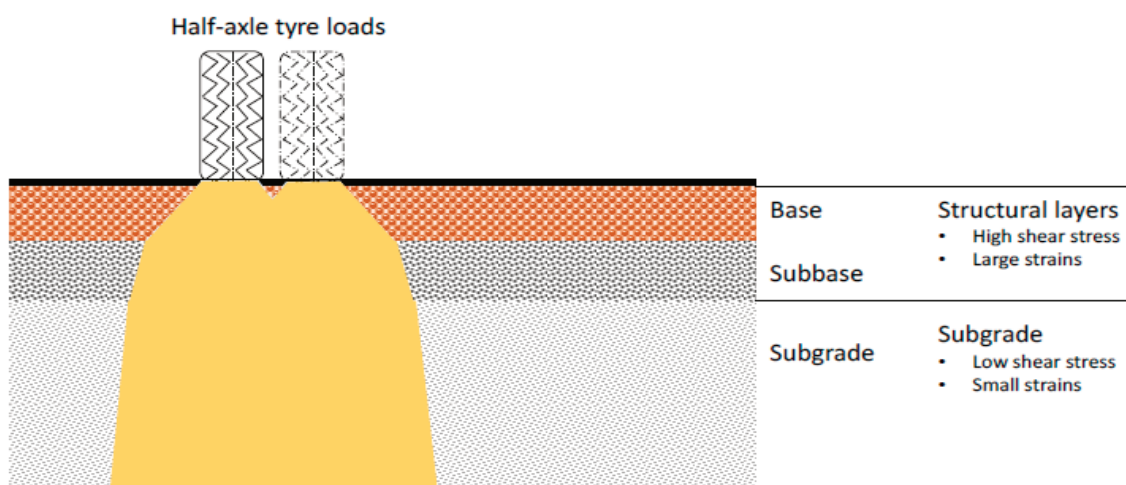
Use of stiff upper pavement layers to distribute stress on subgrade
